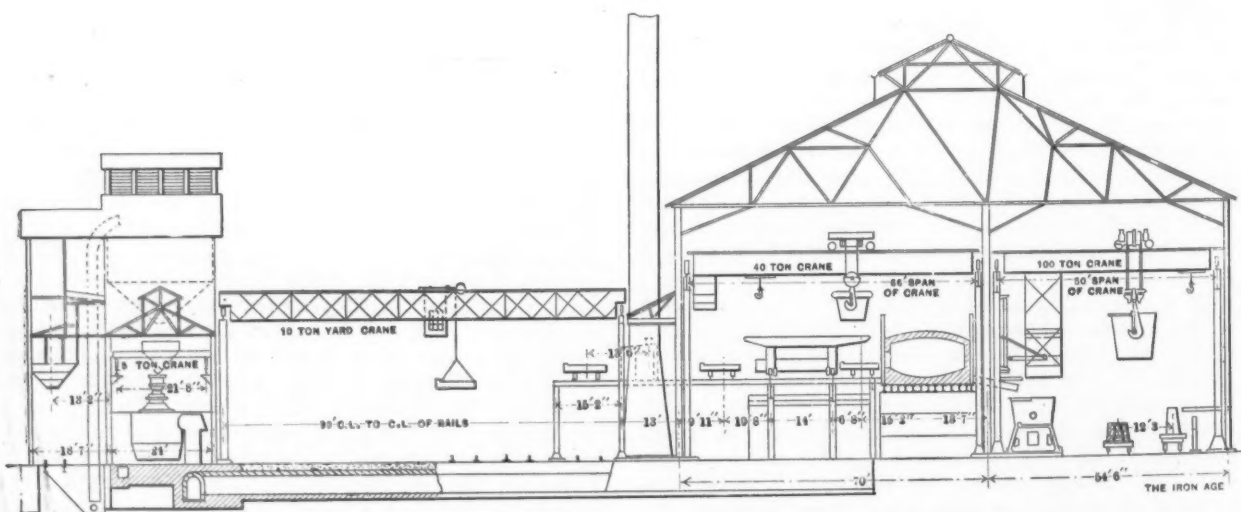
Section through the Open Hearth Building, Stock Yard and Producers.
